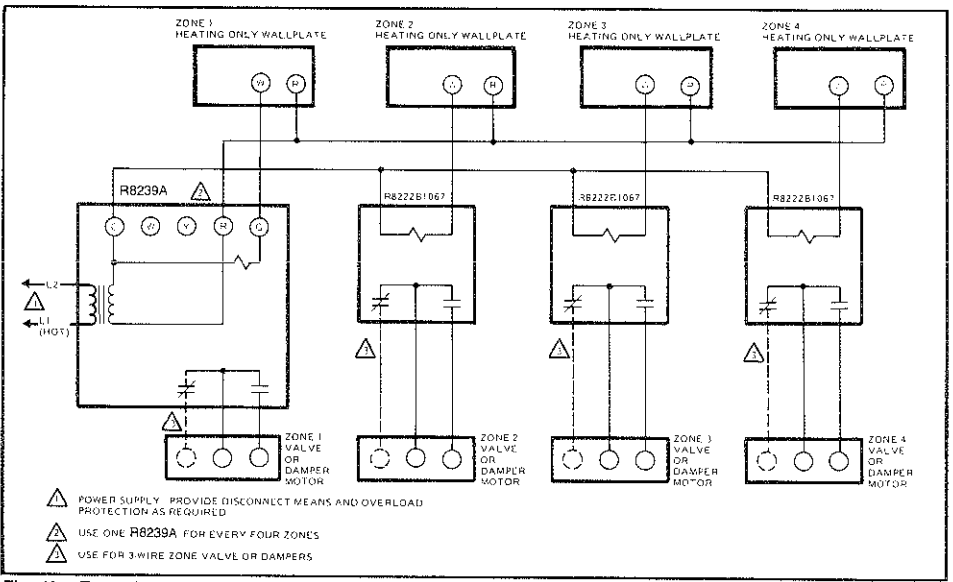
T8600A,B circuit for controlling 2- or 3-wire zone valves or dampers. Heating or cooling equipment is operated by an end switch on the zone valve or motor, or by a thermostat in a master zone.
